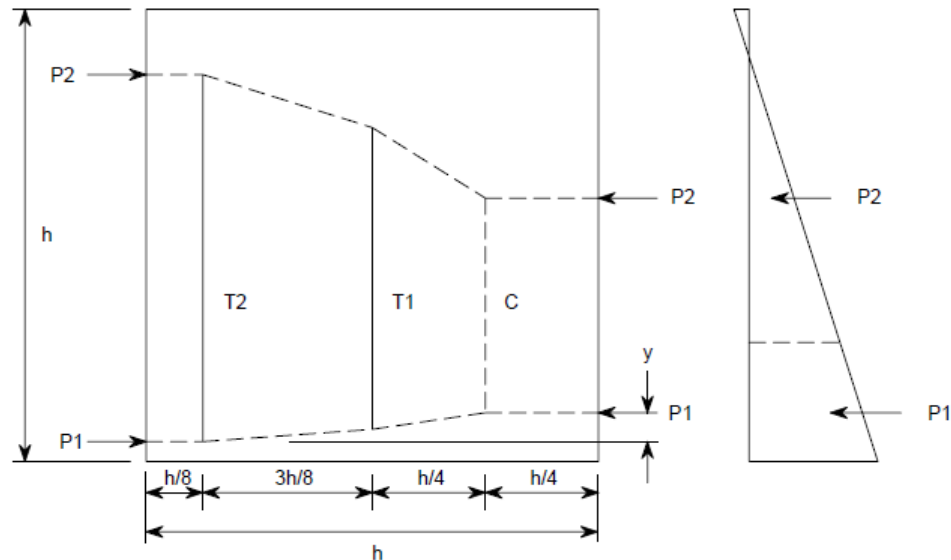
The double-tie, strut-and-tie model utilized for end anchorage analysis of Girders No.1 thru No.8. Adapted from (Crispino, Cousins, & Roberts-Wollmann, Anchorage Zone Design for Pretensioned Precast Bulb-T Bridge Girders in Virginia, 2009).
